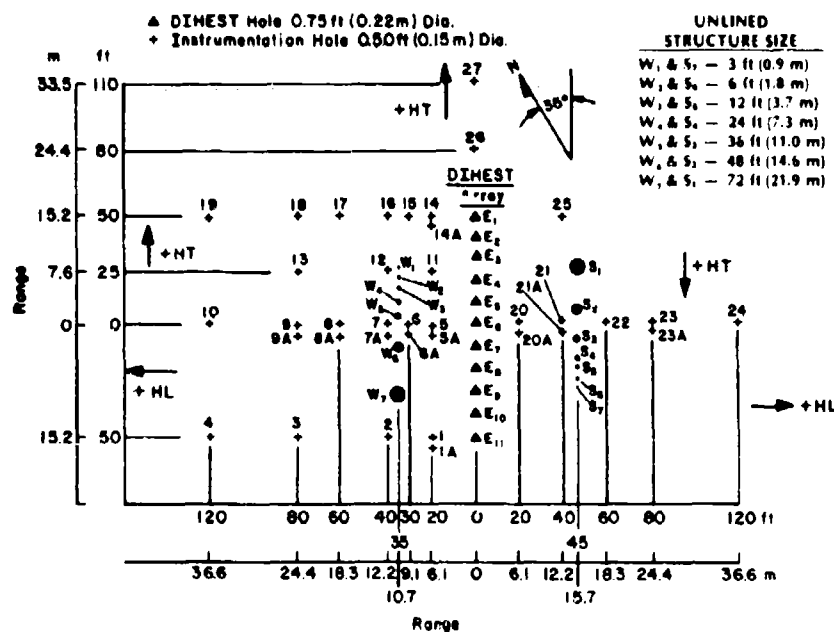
Plan view of project STARMET (from Blouin and Kaiser 1972).
